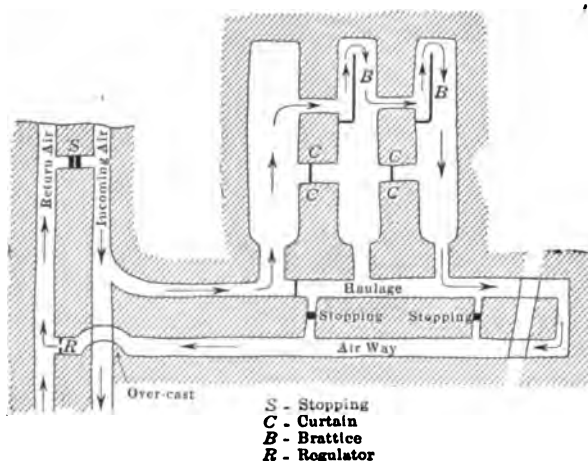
Plan of ventilating system used in room and pillar mining.
